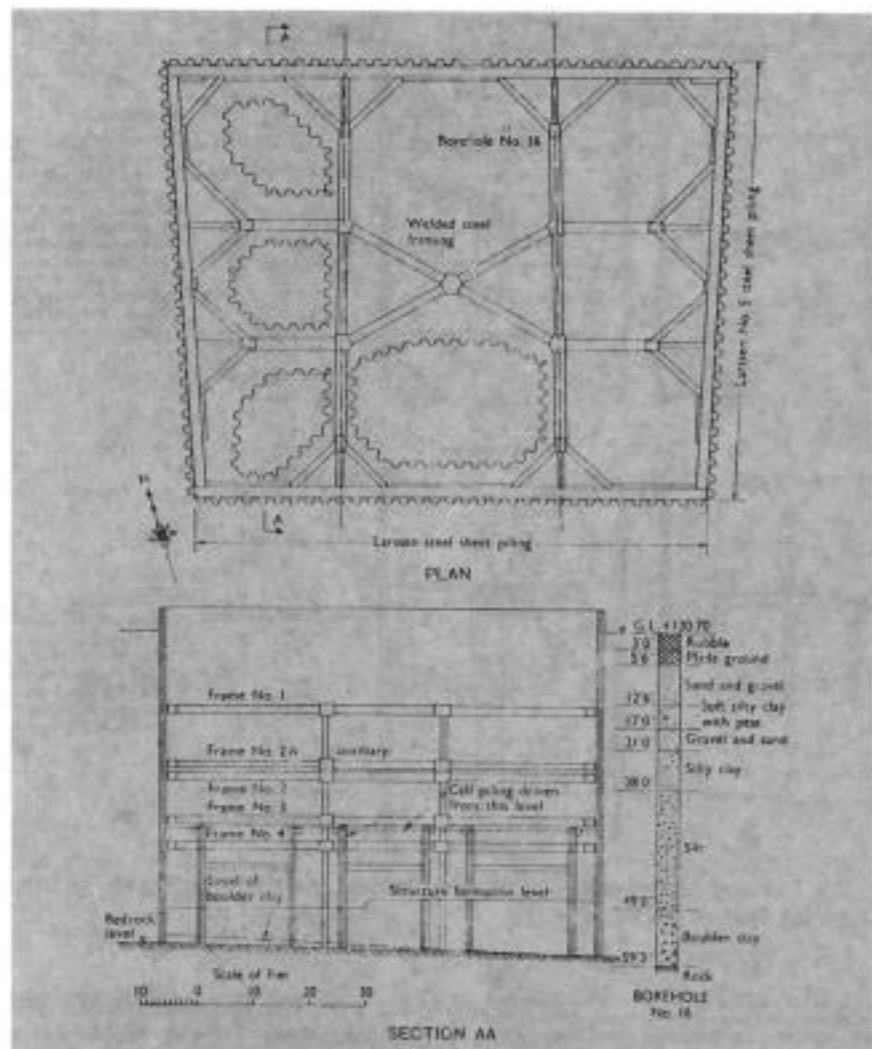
Clyde Tunnel: plan and vertical cross-section of completed partial cofferdam (Haxton and Whyte⁶)
